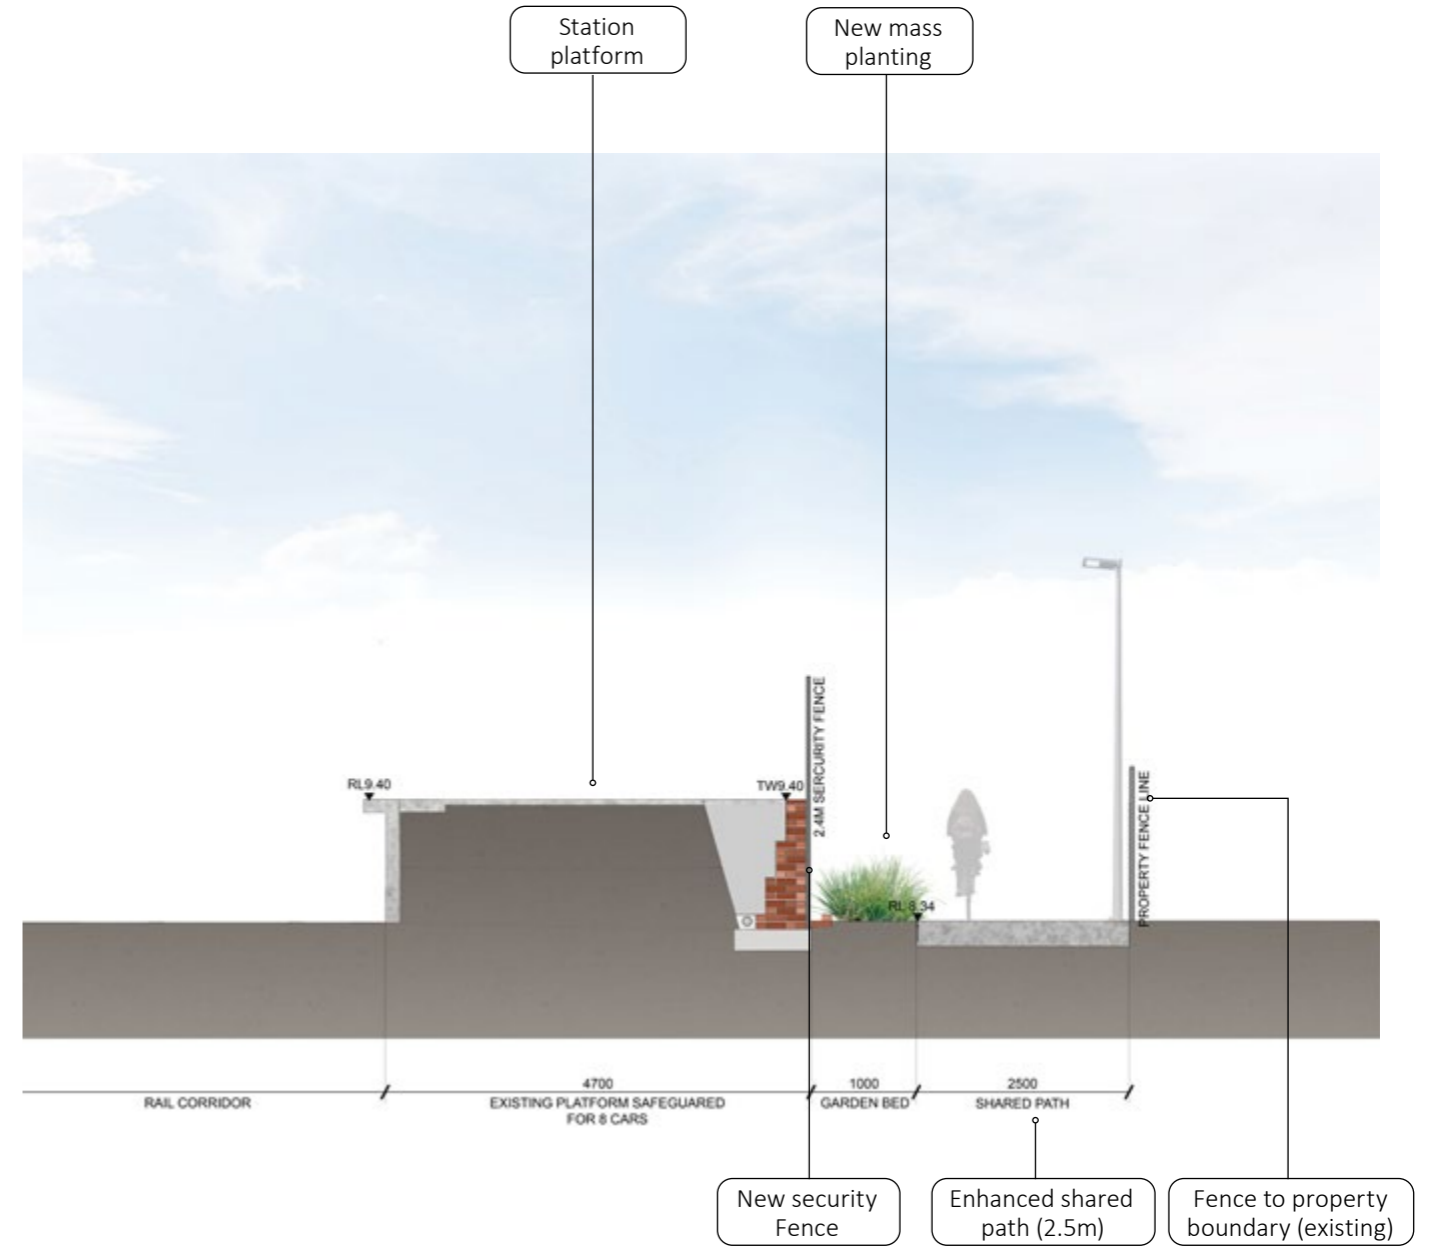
Section B Marrickville - Detailed section of the shared path
